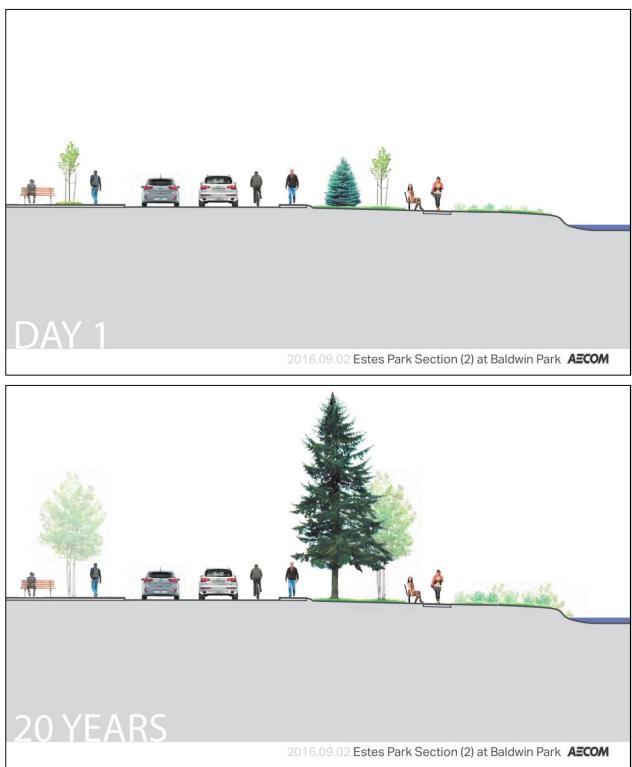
Riverside Drive at Baldwin Park Cross Sections
